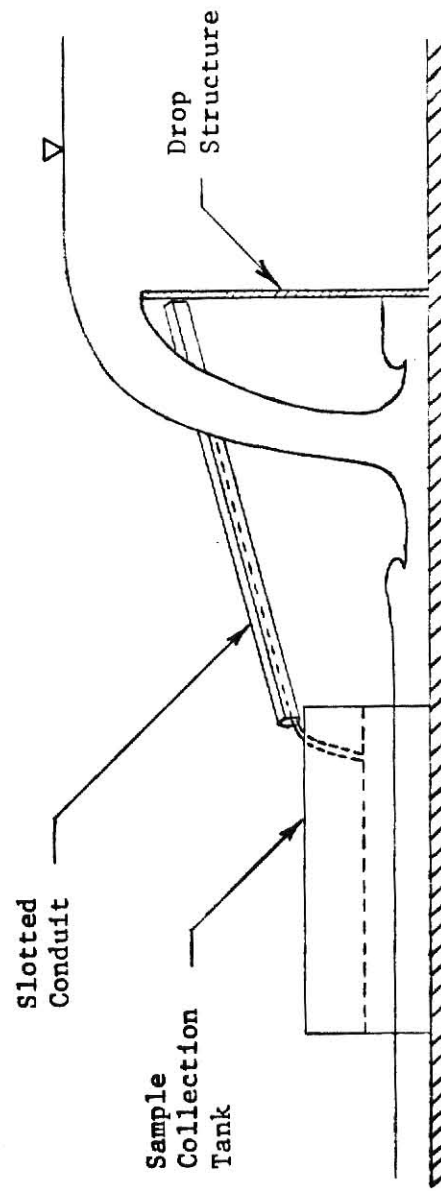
A slotted conduit and drop structure arrangement for sampling runoff.
